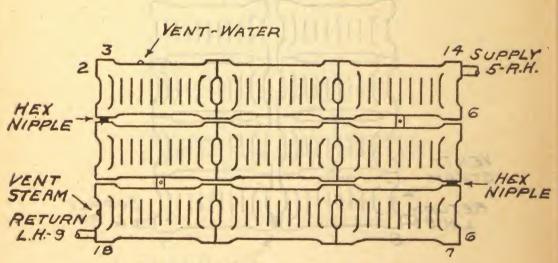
Assembled nine sections in three tiers—using adjustable spacing saddle
